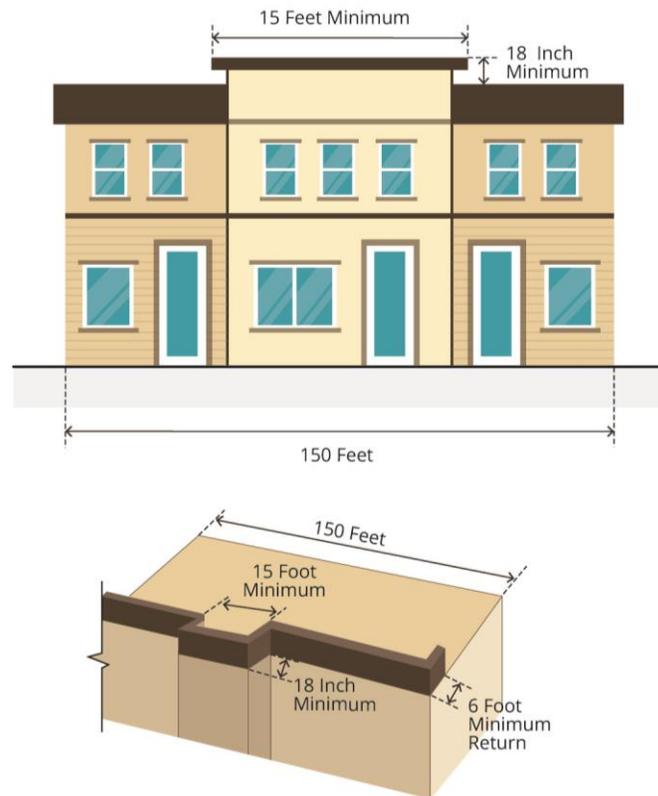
D MULTI-UNIT DWELLINGS, ROOF LINE
